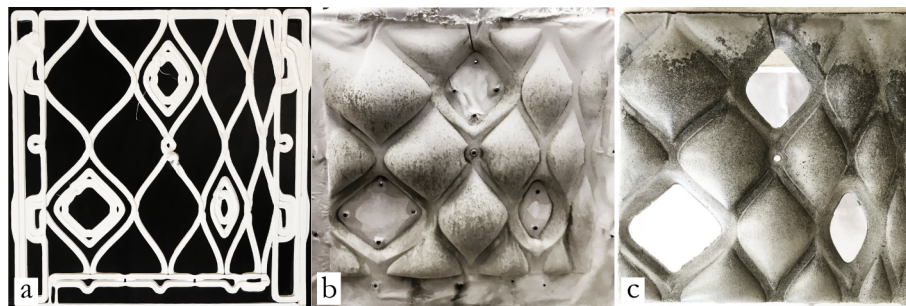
Printed vertical formwork with block-outs and clamp detail, partly demoulded cast and the finished concrete piece.
